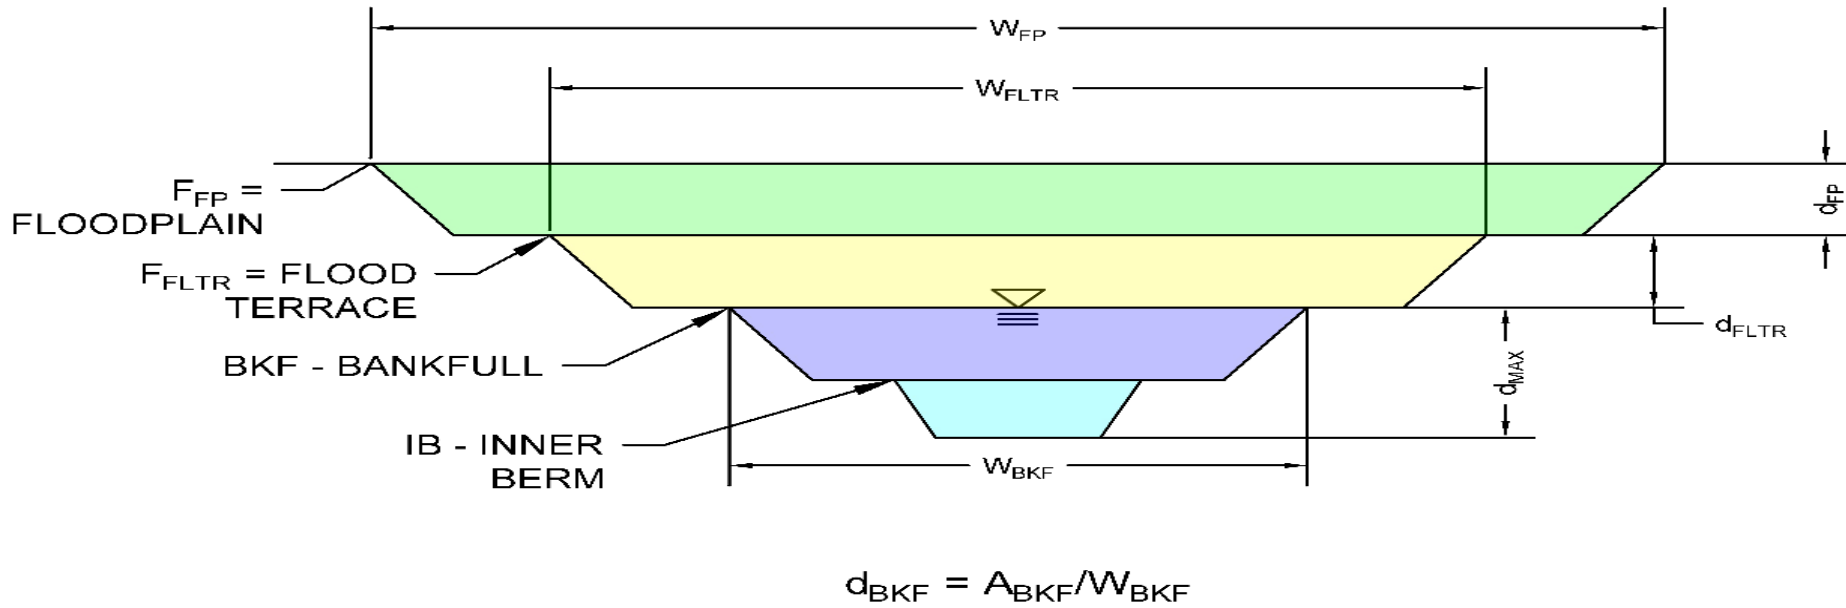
Typical riffle (tangent section) channel cross-section and channel acronyms.
